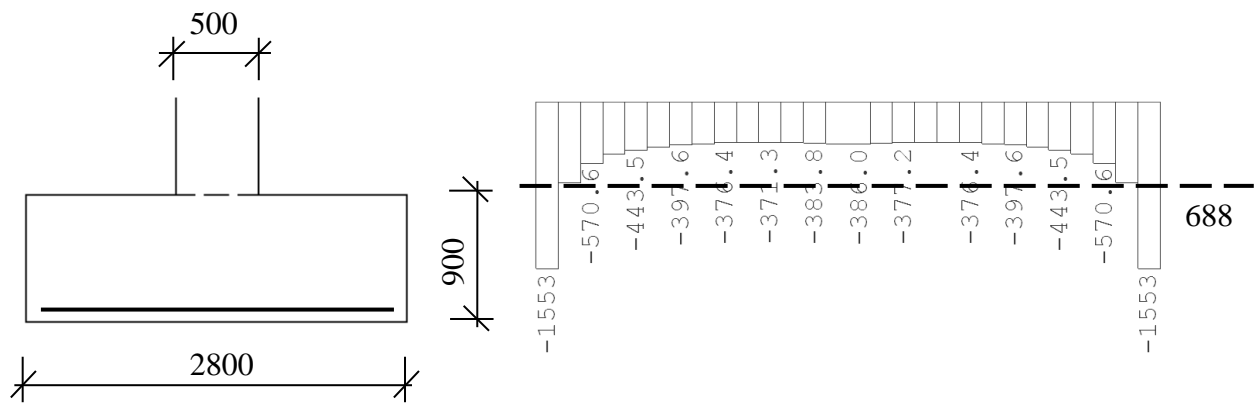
Footing without shear reinforcement (left), ground stress [kPa] (right) – Subsoil 2.
